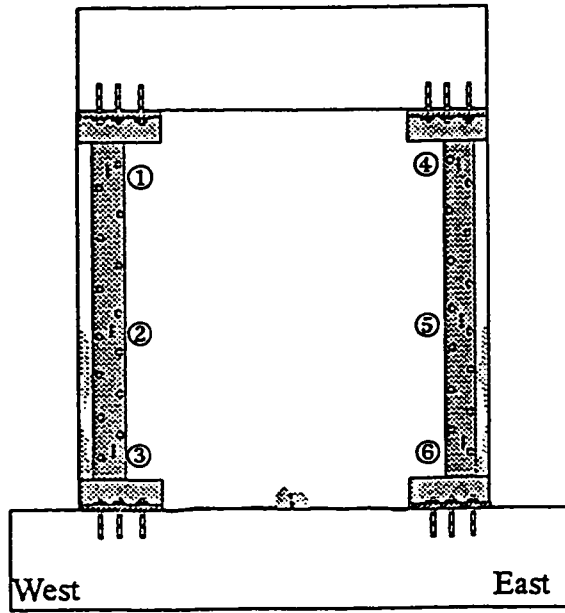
Strain gauge locations on steel strips of repaired wall (Wall 11RP)
